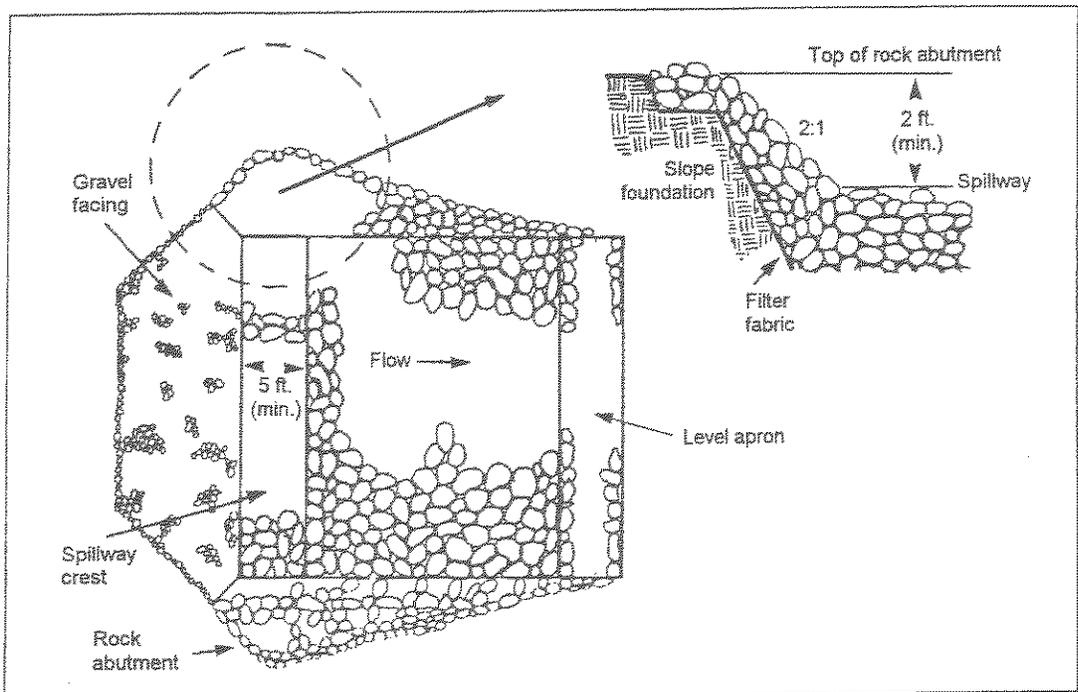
C. Plan view of a rock dam with spillway detail.
